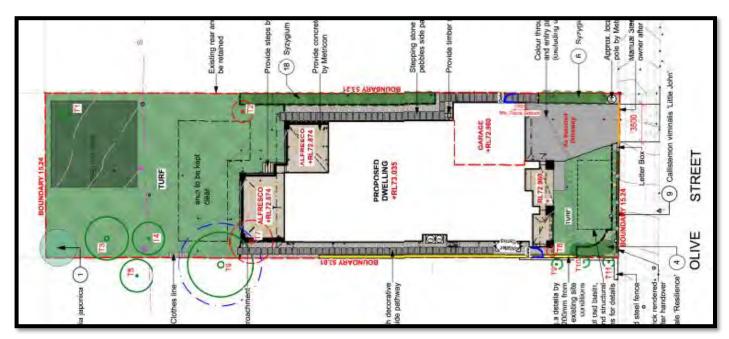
Proposed landscaping plan with proposed rear yard planting to be re-located away from adjoining boundary.
